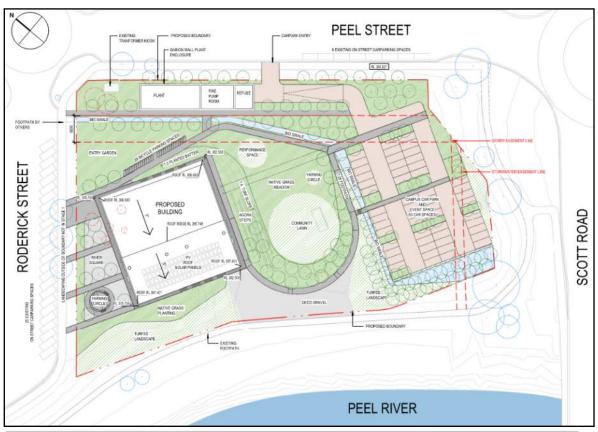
Proposed Site Plan (Source: Architectus & Tyrrell Studio)
